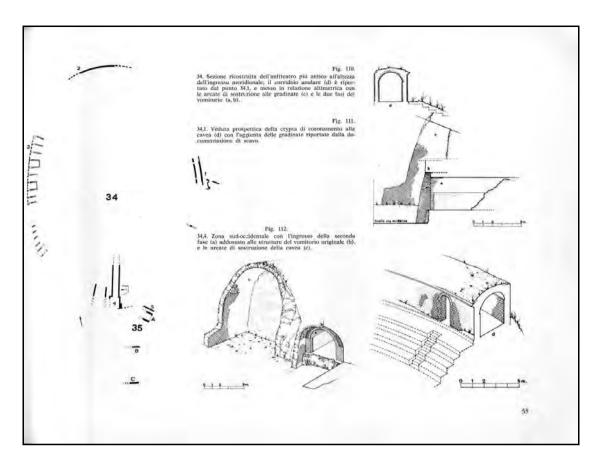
Plan, section and isometric drawings of the Republican amphitheatre (after Sommella 1978)
